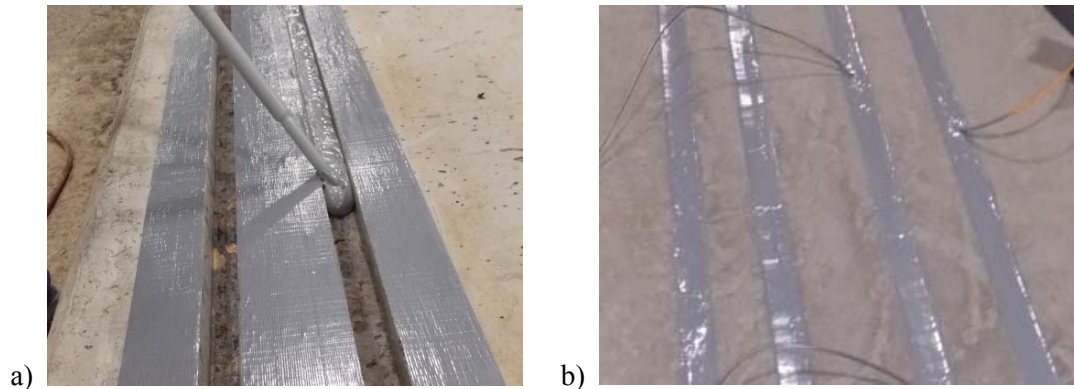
a) First epoxy layer and b) Finished NSM installation
